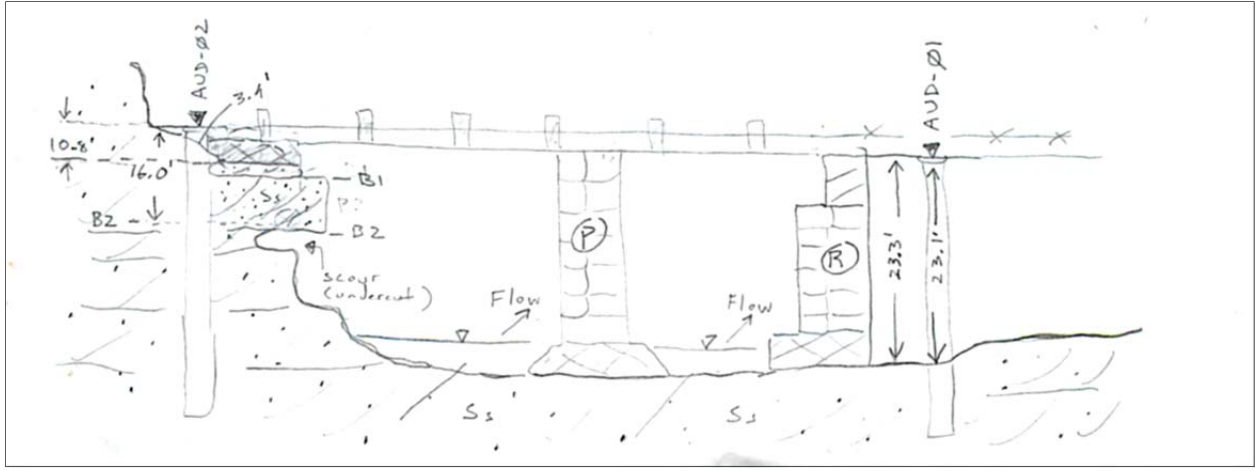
Field sketch of Audra Park Bridge, looking downstream.
